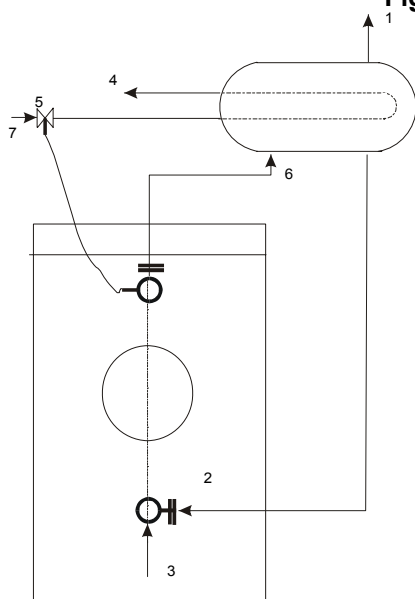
Boiler with after- cooling loop – connecting dimensions
